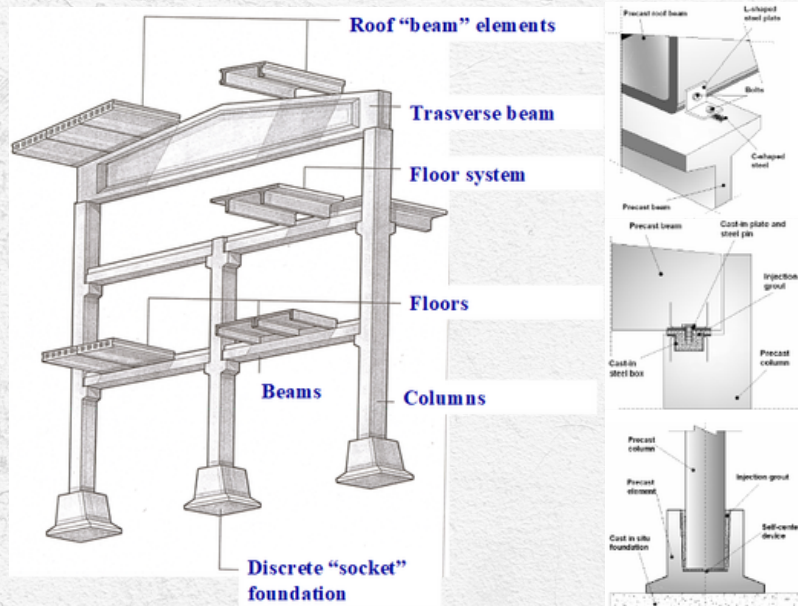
Typical structural system and connections details for precast industrial buildings in European construction practice
